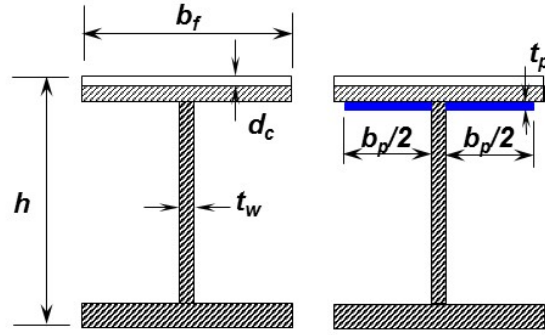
Steel beam section loss in the top flange and the repaired beam.
